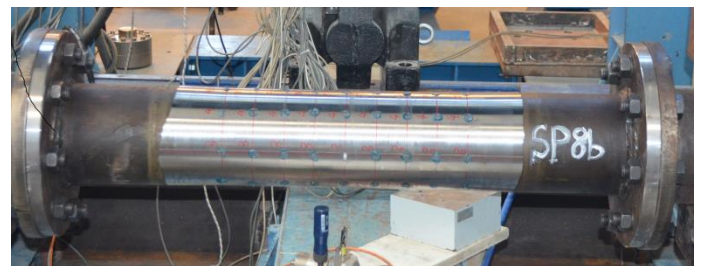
X52 6-inch diameter pipe specimens, machined at 2.8mm thickness.
